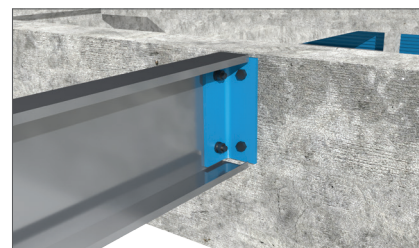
Detail of the longitudinal trimmer connection to a concrete element by means of an angle piece, which is fixed by bolts (chemical anchors or dowels)
